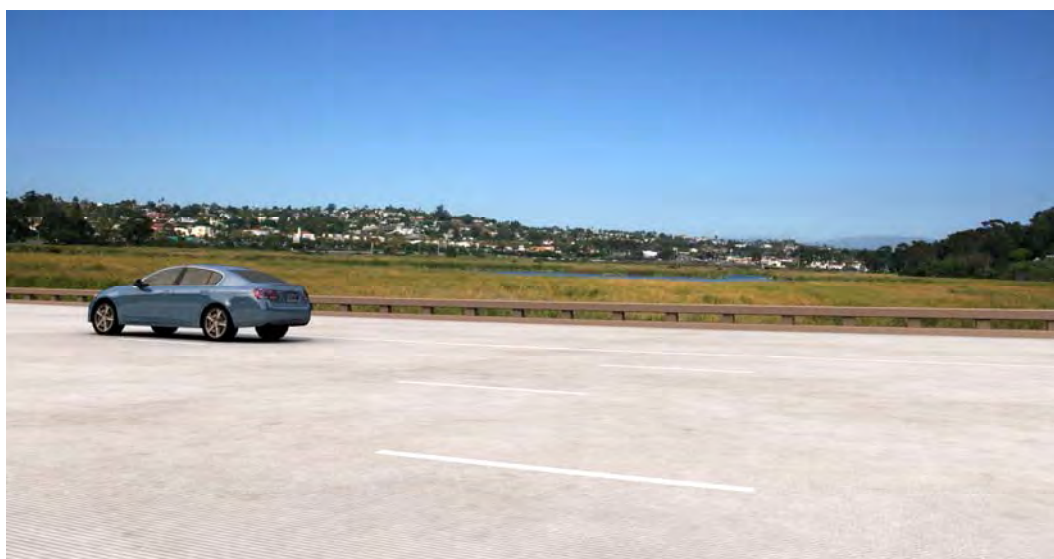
I-5 at Agua Hedionda Lagoon: Proposed view looking south with landscaping and retaining wall
